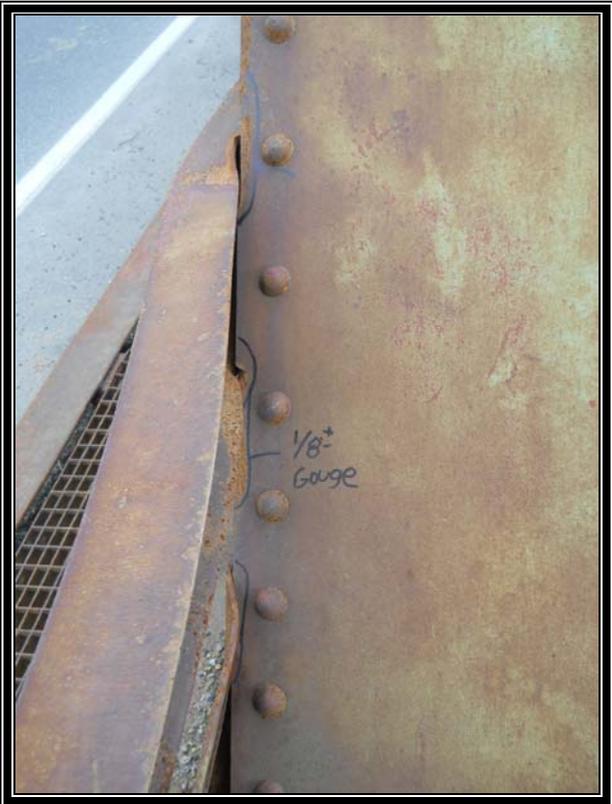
Span 1 South Truss End Diagonal Member L0-U1 Vehicular Impact Damage
